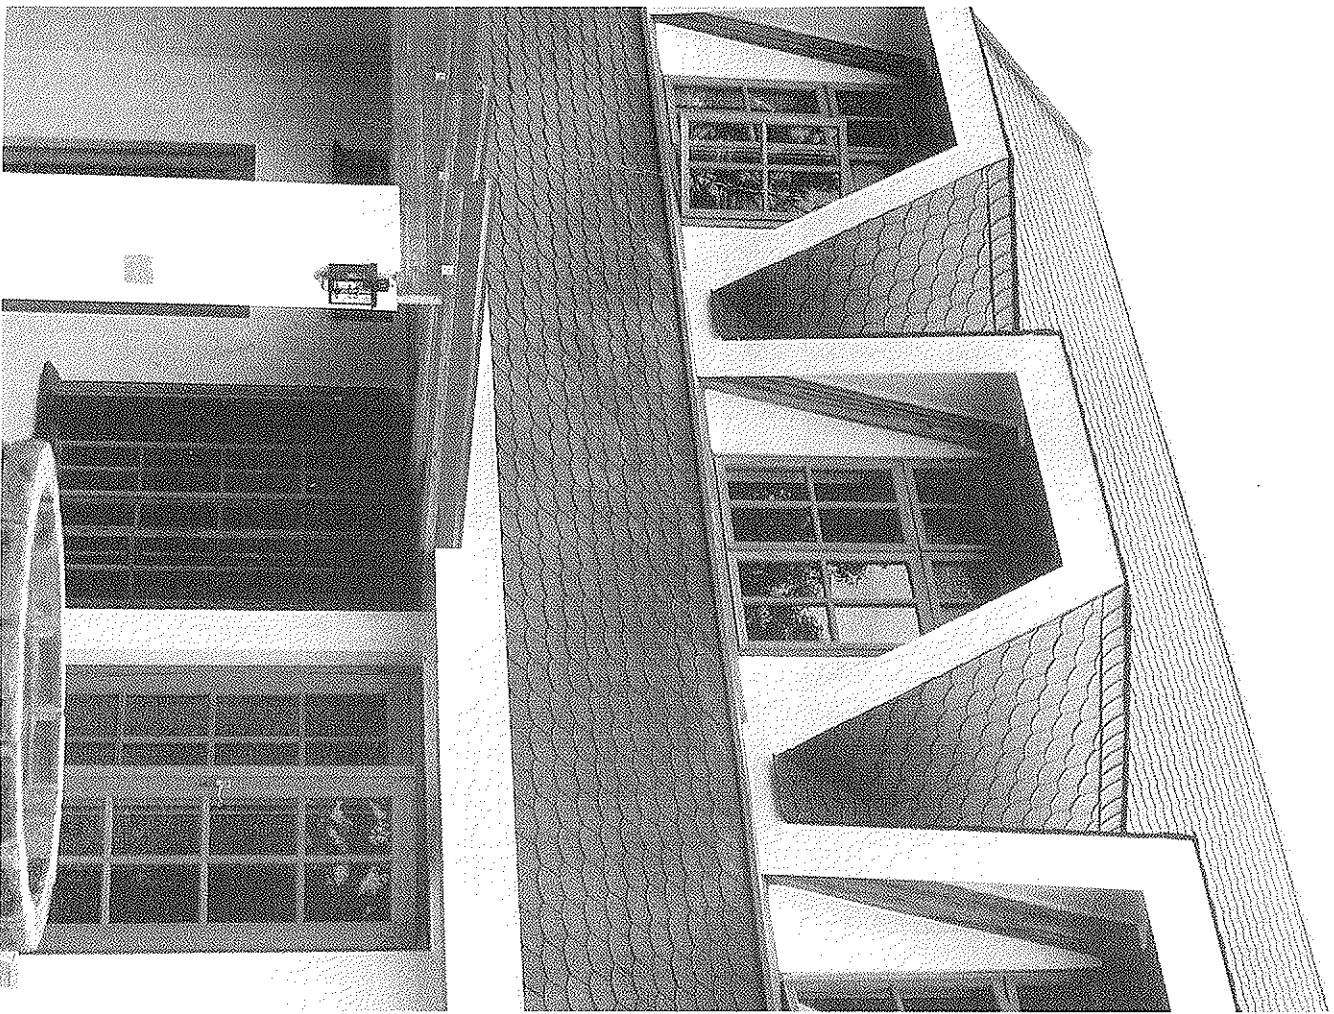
Cladding of residential building with Beaver type shingles. These shingles are advantageous when accuracy is important, such as in this roof with its square dormer windows.
